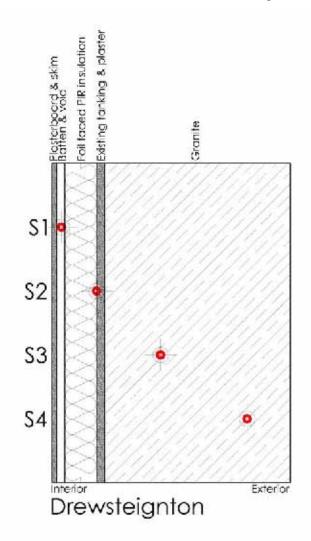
Wall Section showing position of sensors, Mill House, Drewsteignton.
